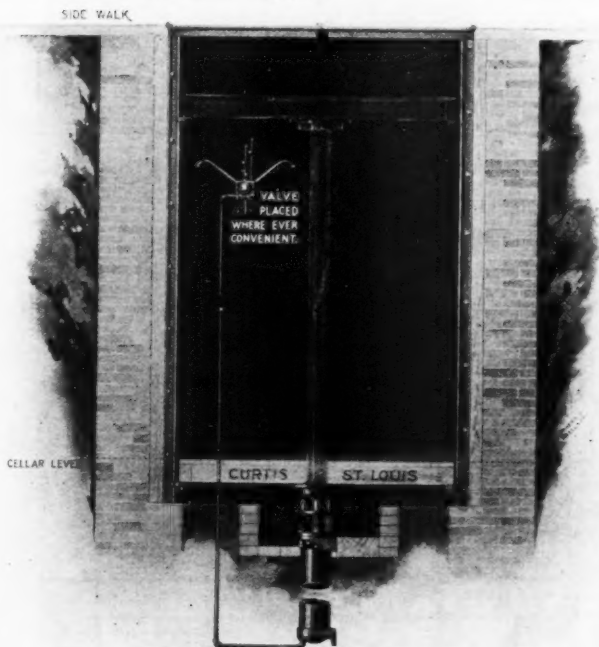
PLATFORM TYPE PNEUMATIC ELEVATOR.
